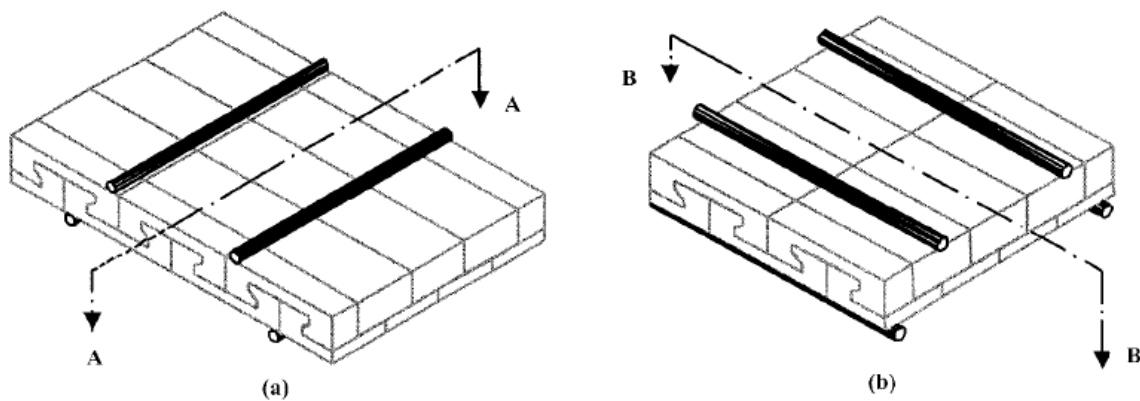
Bending loading (a) tension parallel to bed joint; (b) tension normal to bed joint (adapted from [100])
